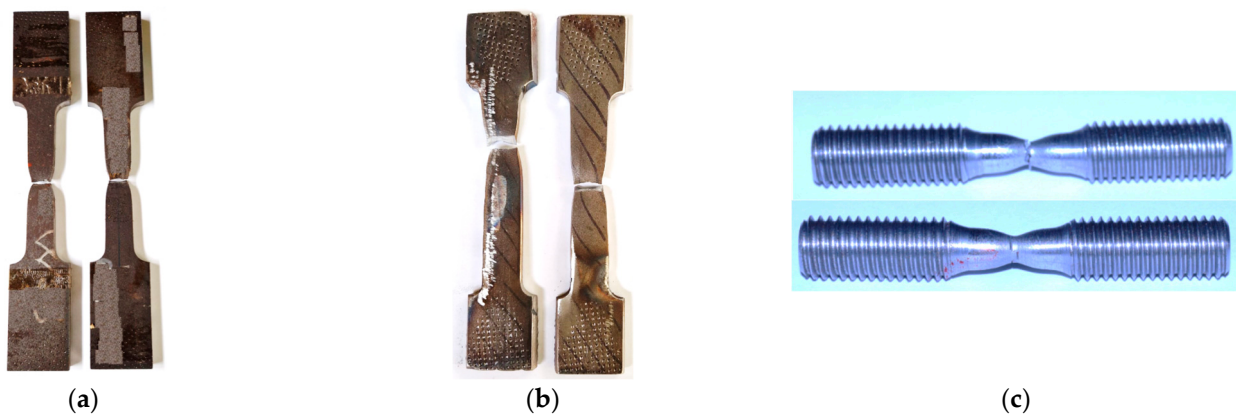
Fracture of the tensile specimens for: (a) RHS; (b) CHS; (c) bolt.
